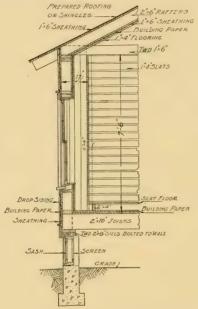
Details of construction of a sweet-potato storage house. (Courtesy, U. S. Department of Agriculture).
